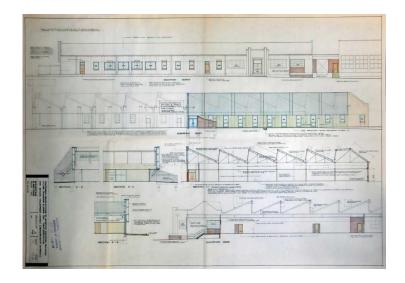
Drawing showing proposed alterations to the Administration Building, 1988. (Source: Pacific Brands plan room)
